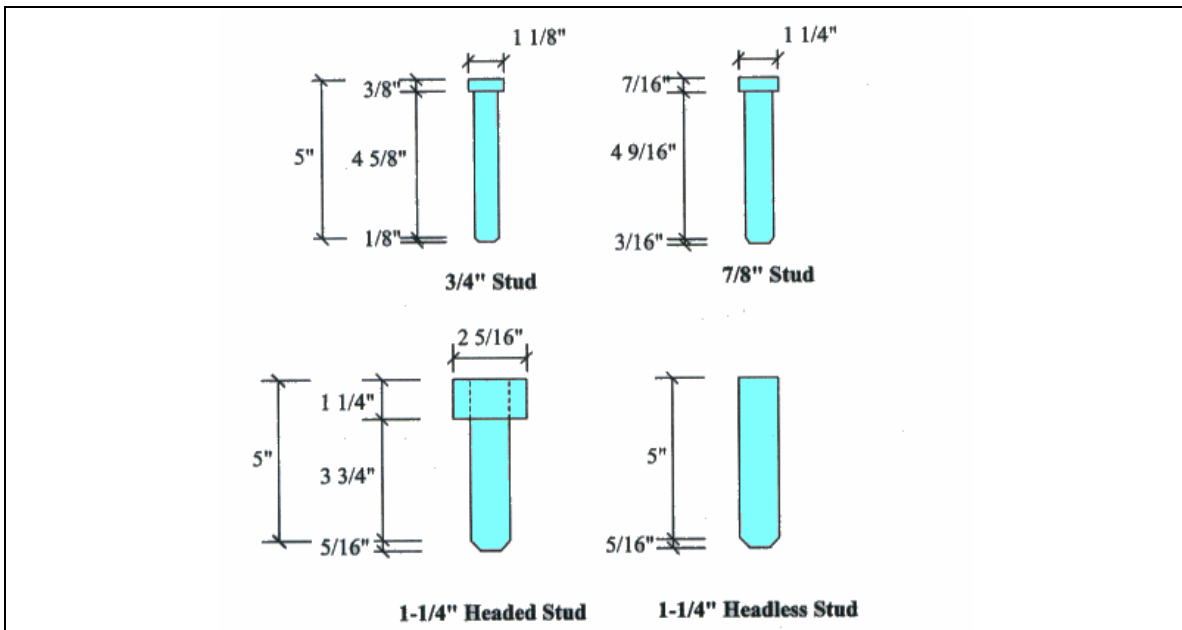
Existing and proposed shear studs (Tadros and Baishya, 1998)
